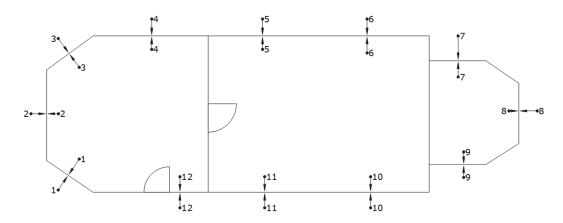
Drawing plan of the wooden church with markings of the 12 indoor and outdoor sampling points.
